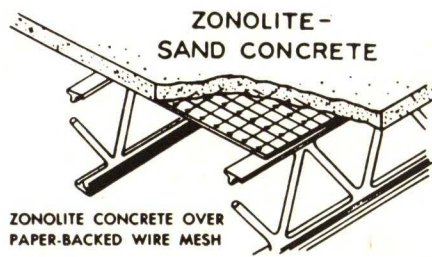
Zonolite-Sand Concrete Floor Slabs over closely-spaced joists.
